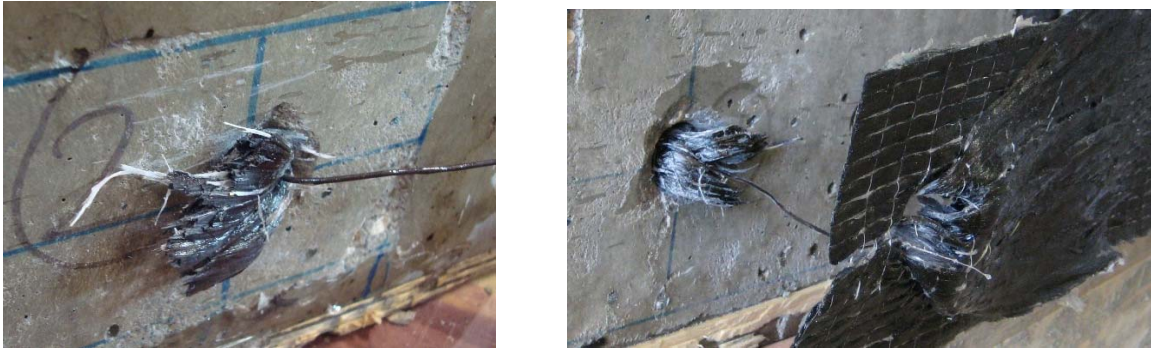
Anchor fractures, specimens BL-2 and BL-3
